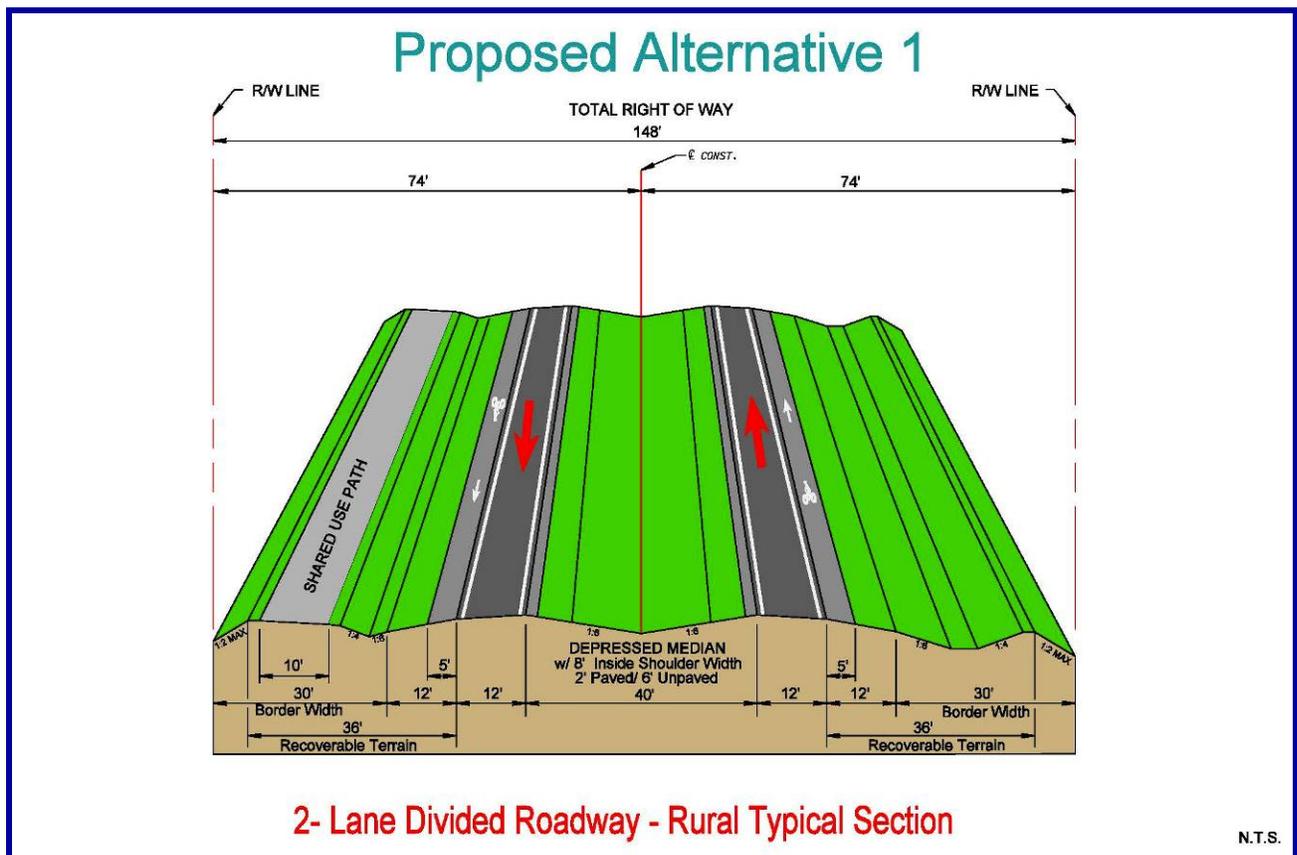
Alternative 1 Proposed Typical Roadway Section (Rural)
